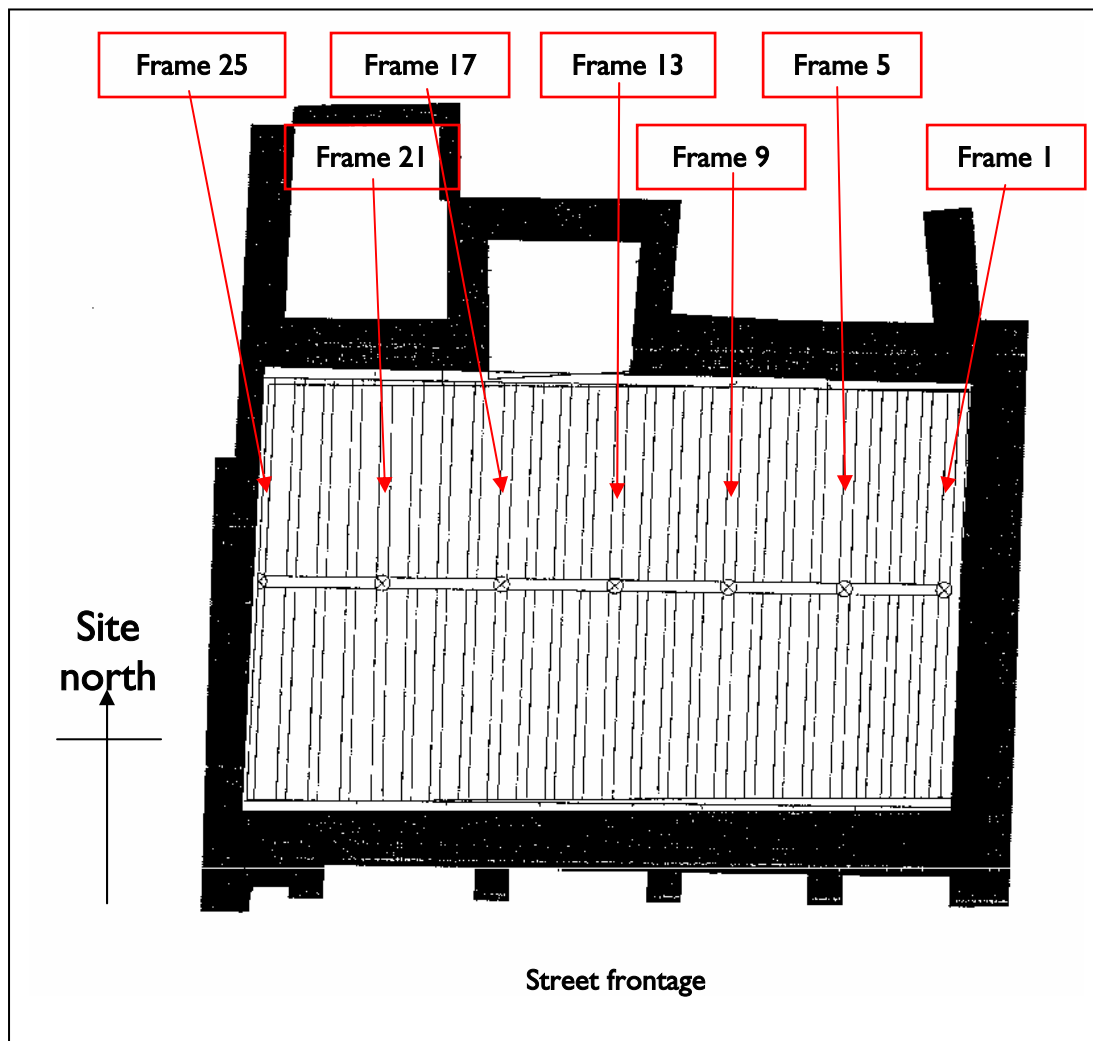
Plan showing frame numbers to help locate sampled timbers
